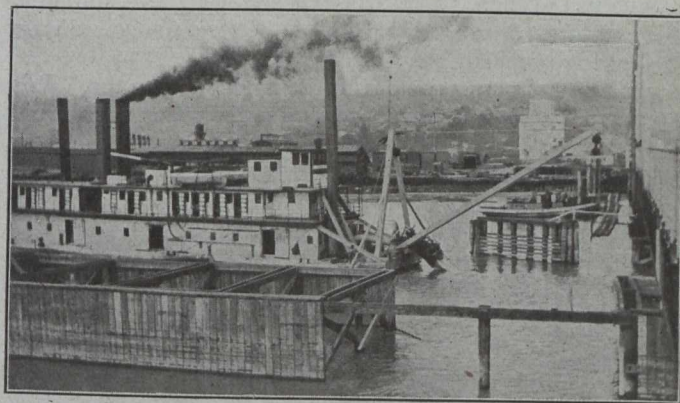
Dredge at Work Digging Trench for Submerged Main. Note Timber from Draw Protection Pier Has Been Temporarily Removed.
